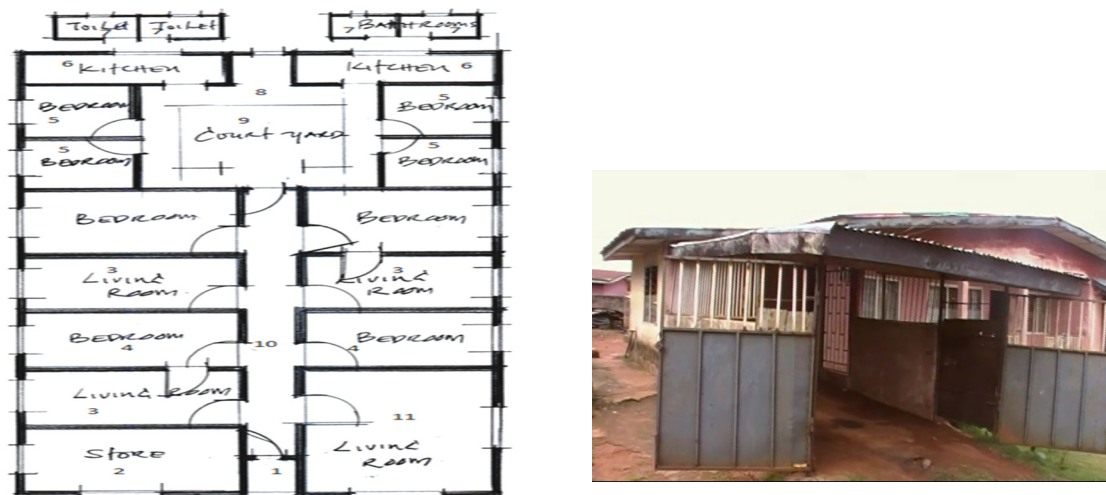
Plan of a Common Corridor House and a typical façade (Source: Ekhaese 2011)
